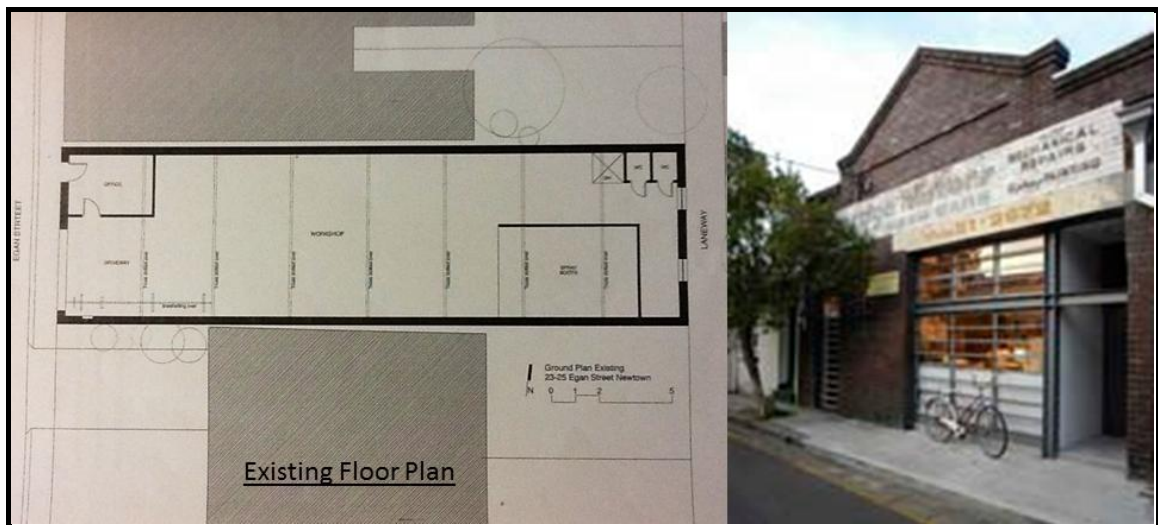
EGAN ST. FLOOR PLAN AND FACADE
